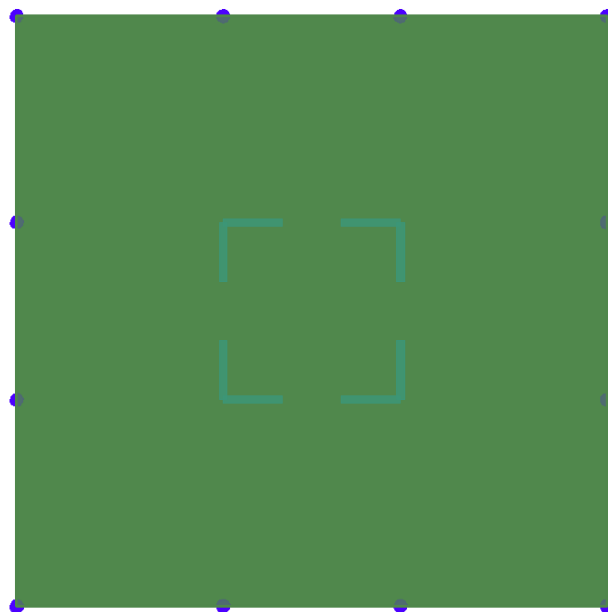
Imported 8-Story Structure Shown in Plan View in ADAPT-Edge
